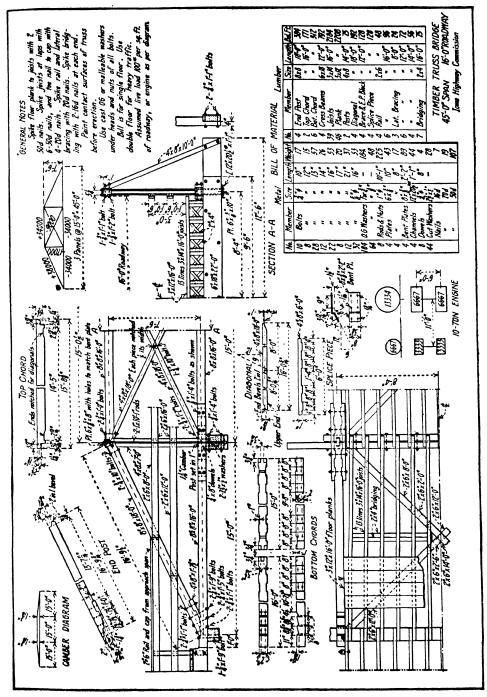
TIMBER TRUSS BRIDGE. IOWA HIGHWAY COMMISSION.
